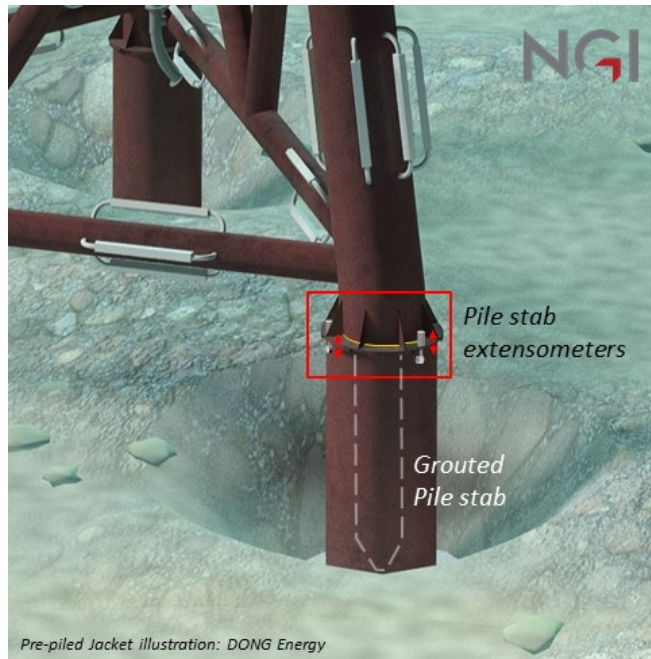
Example of grouted male stab connections to pre-driven piles (OWEC tower)
